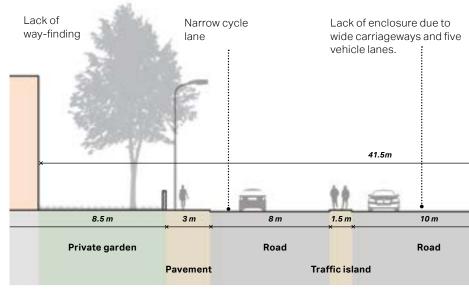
Street section of Bury New Road looking northwest from the junction of Hilton Lar
